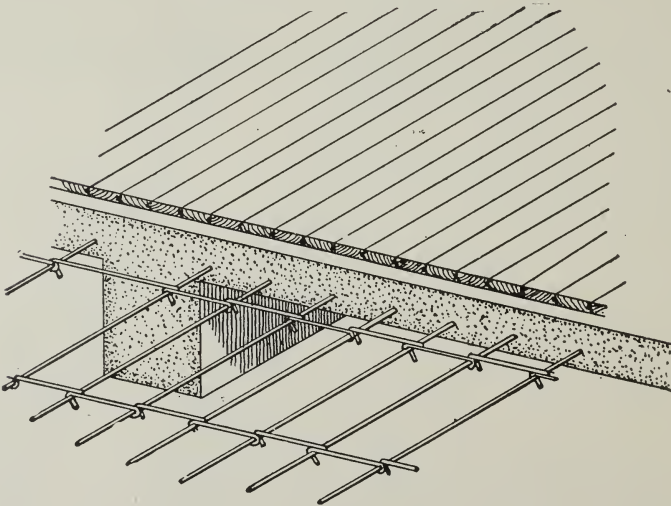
Concrete Floor Slab with Reinforcing Rods and Spring-lock Bar Spacers.
